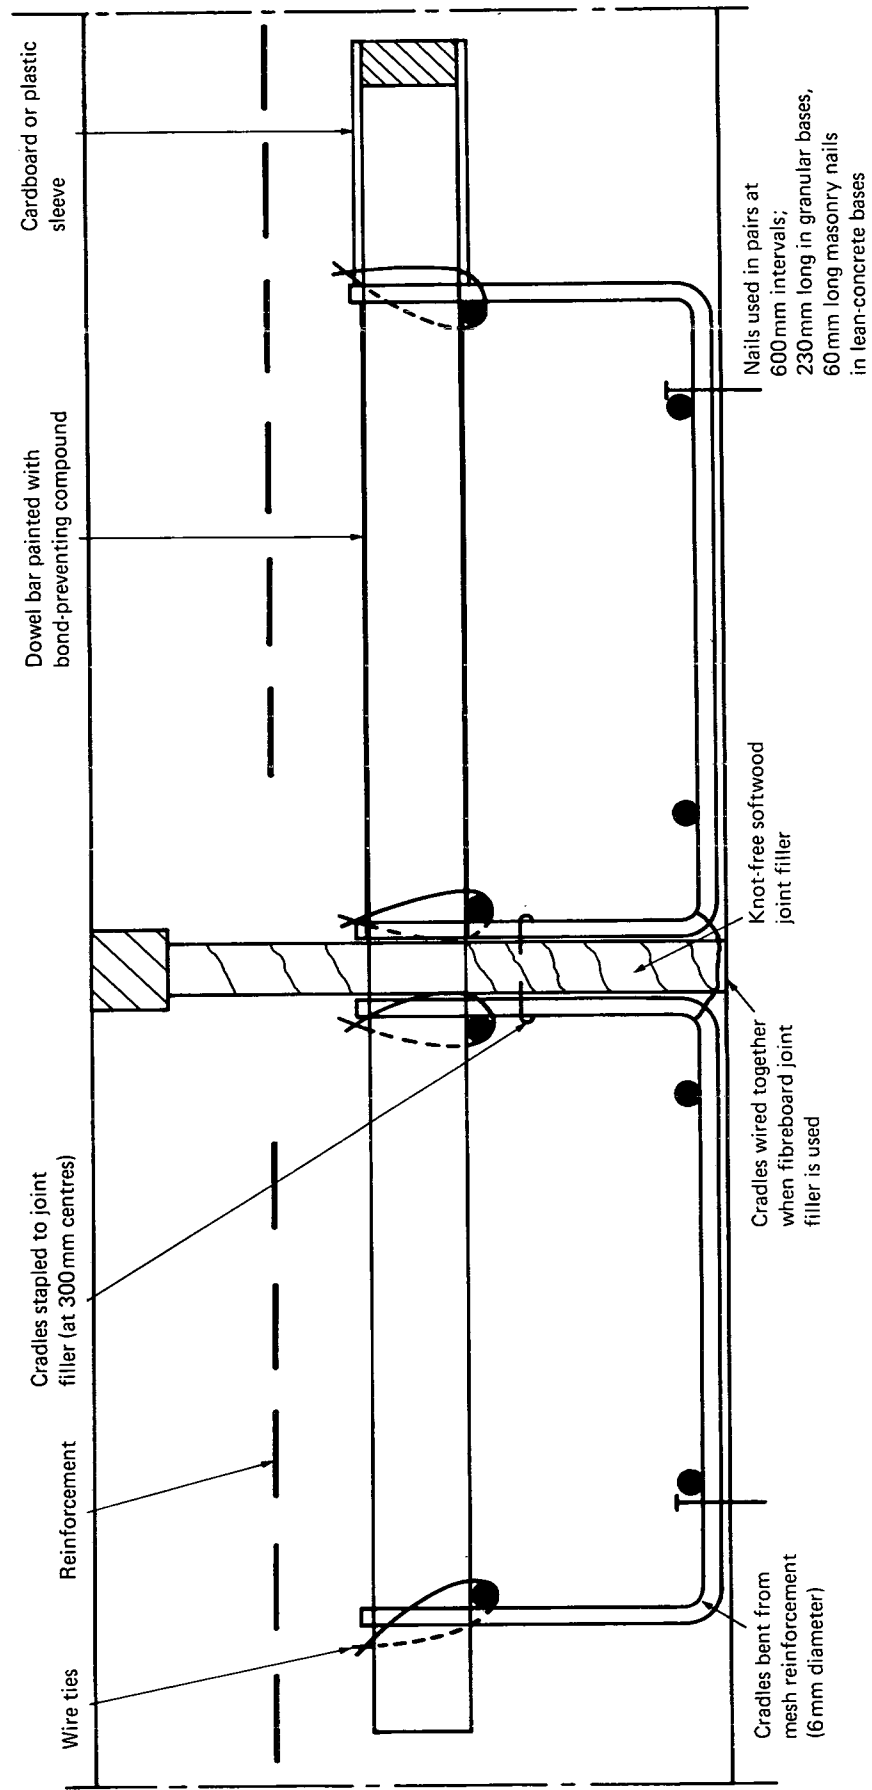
TYPICAL DETAIL OF CRADLE-TYPE ASSEMBLY FOR AN EXPANSION JOINT
